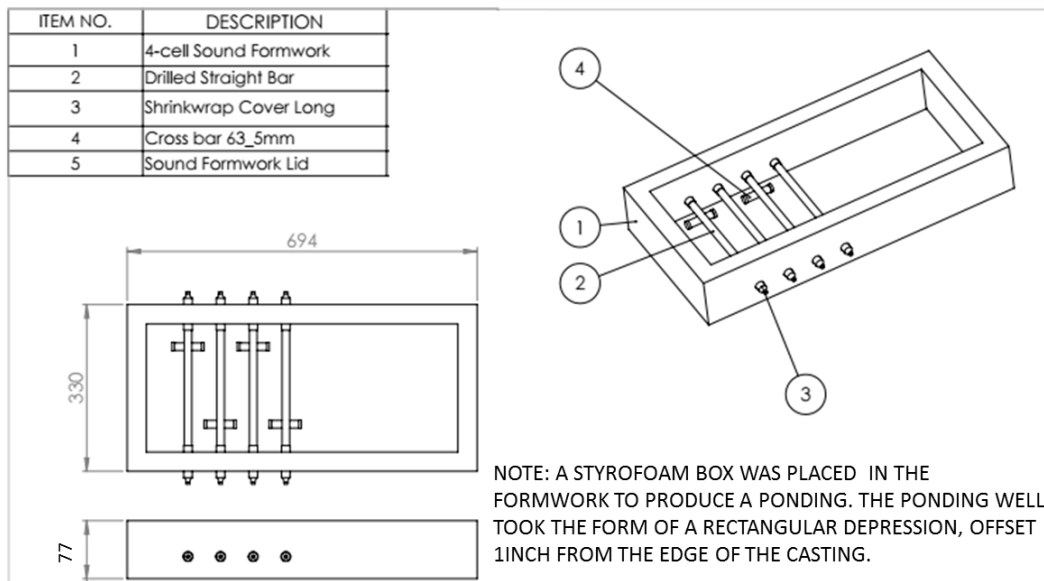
Sound specimen formwork design. The figure shows the plan, side-view and cross-section.
